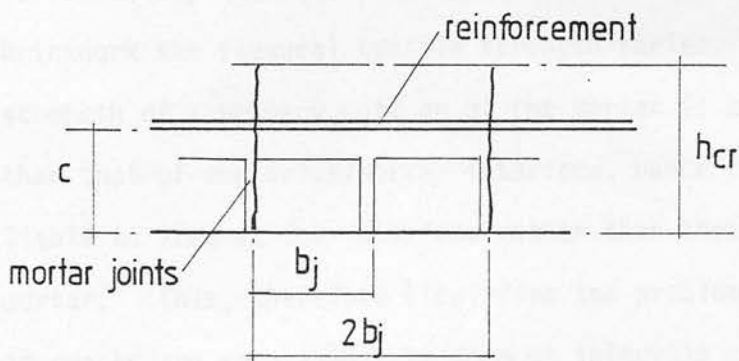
Crack spacing in brickwork beam.
